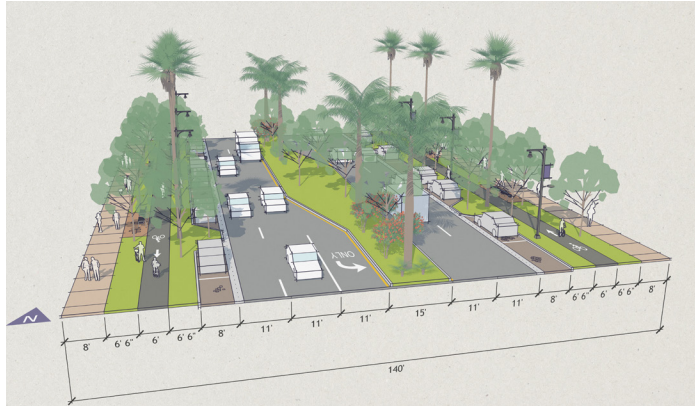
Proposed street section for Fair Oaks Avenue south of Monterey Road
